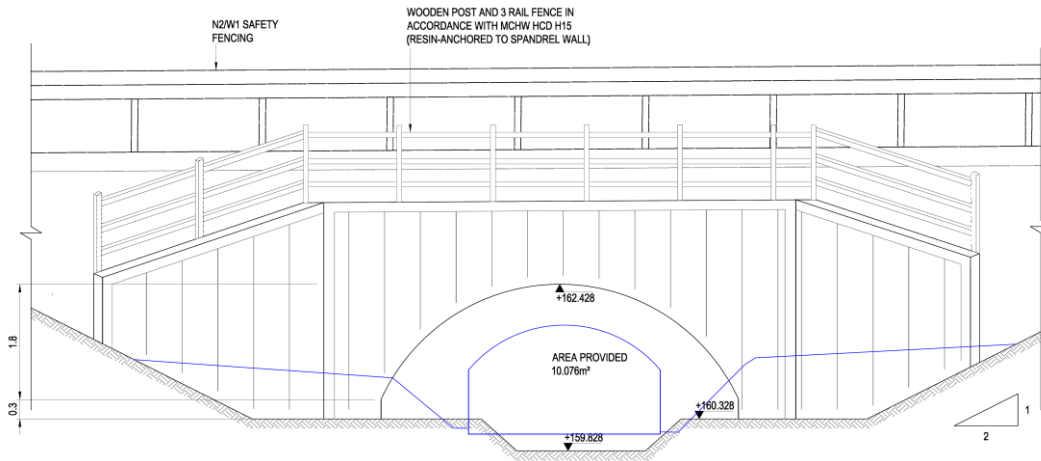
Details of the Existing Flush Bridge (blue) and the Proposed Flush Bridge
